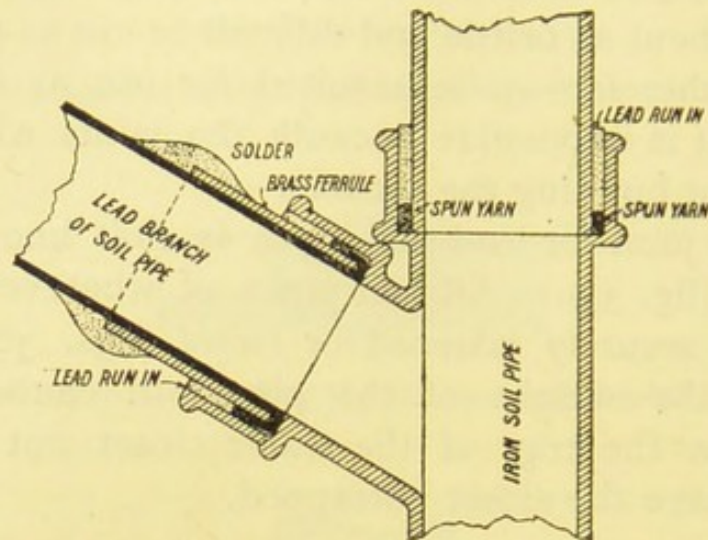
Showing method of connecting lead pipe to iron soil pipe and iron to iron.
